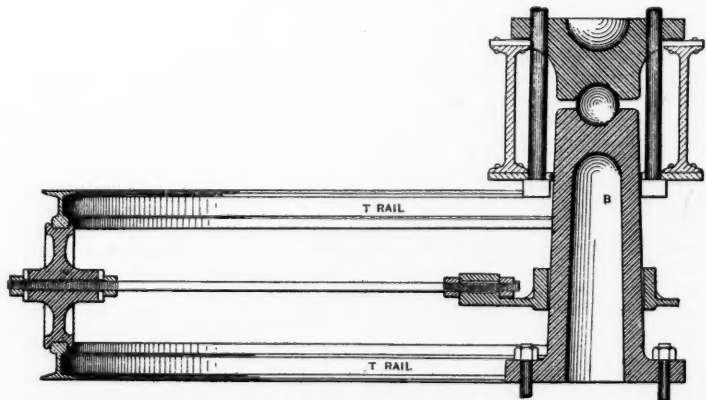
Centre and Roller Bearing, Improved Prairie Turntable.
